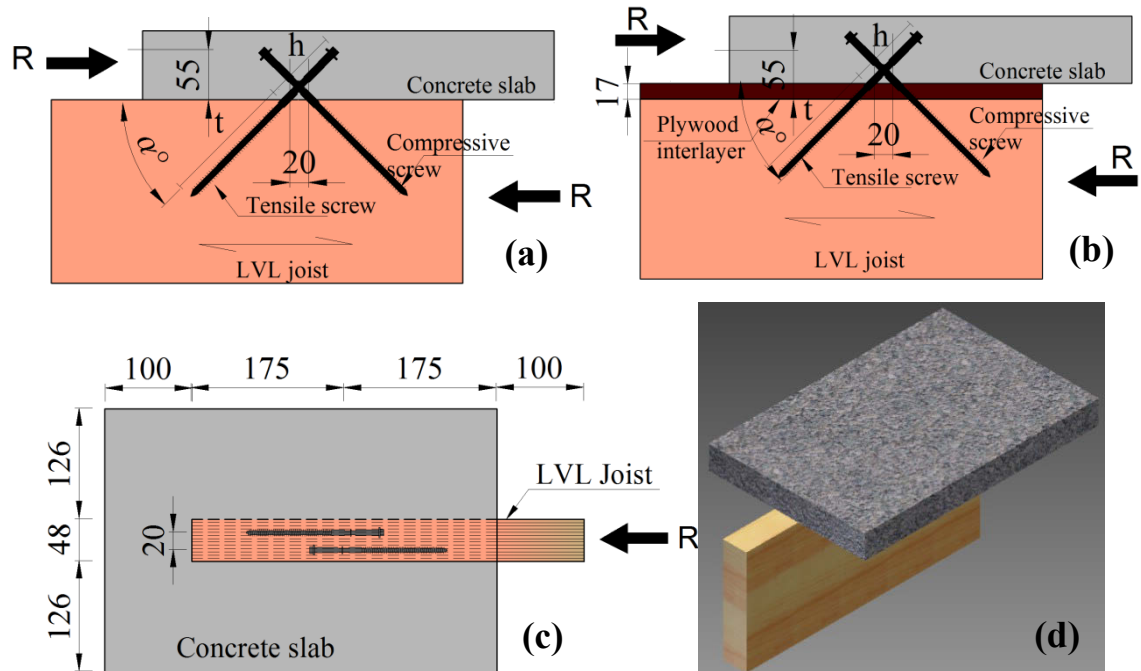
Typical geometry and components of specimens: (a) cross-section of specimen without interlayer (WI series), (b) cross-section of specimen with interlayer (I series) (c) plan and (d) 3D view TCC Specimen (in mm)
